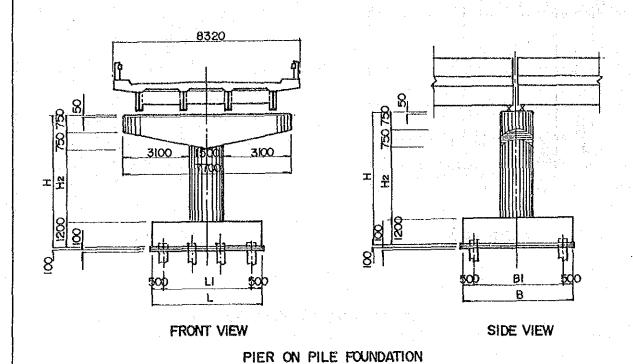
(2/2) TYPICAL PIER (SPAN LENGTH; 18 m)
